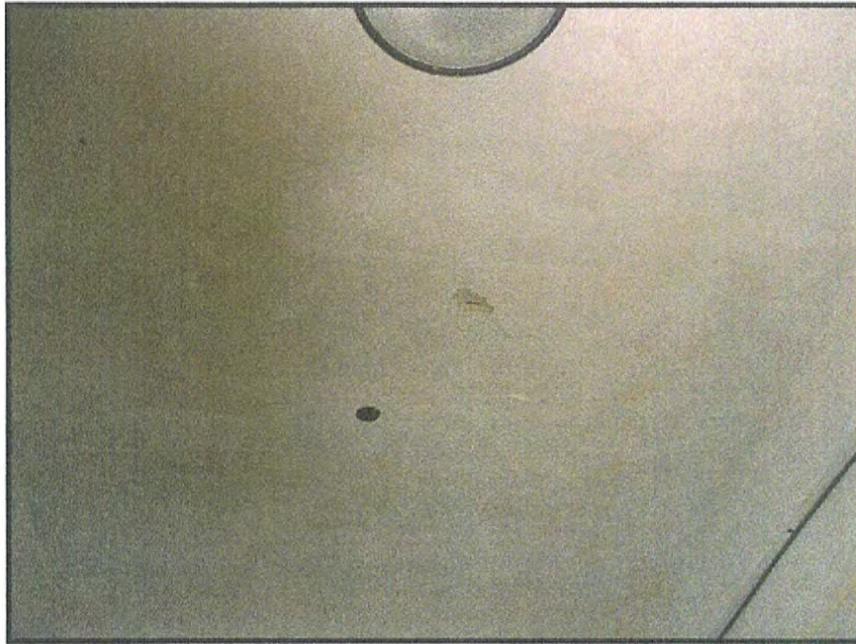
Delaminations along underside of second level slab typically found in all six service bay areas.
